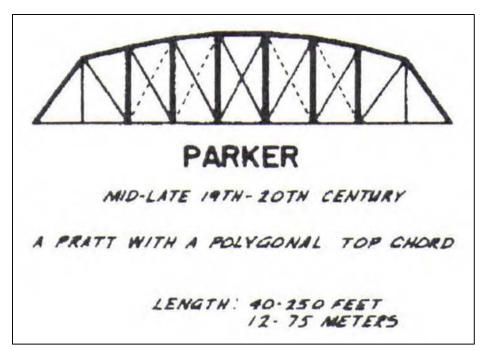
SKETCH OF A PARKER TRUSS BRIDGE (NORTH CAROLINA DEPARTMENT OF TRANSPORTATION [NCDOT] 2013)
